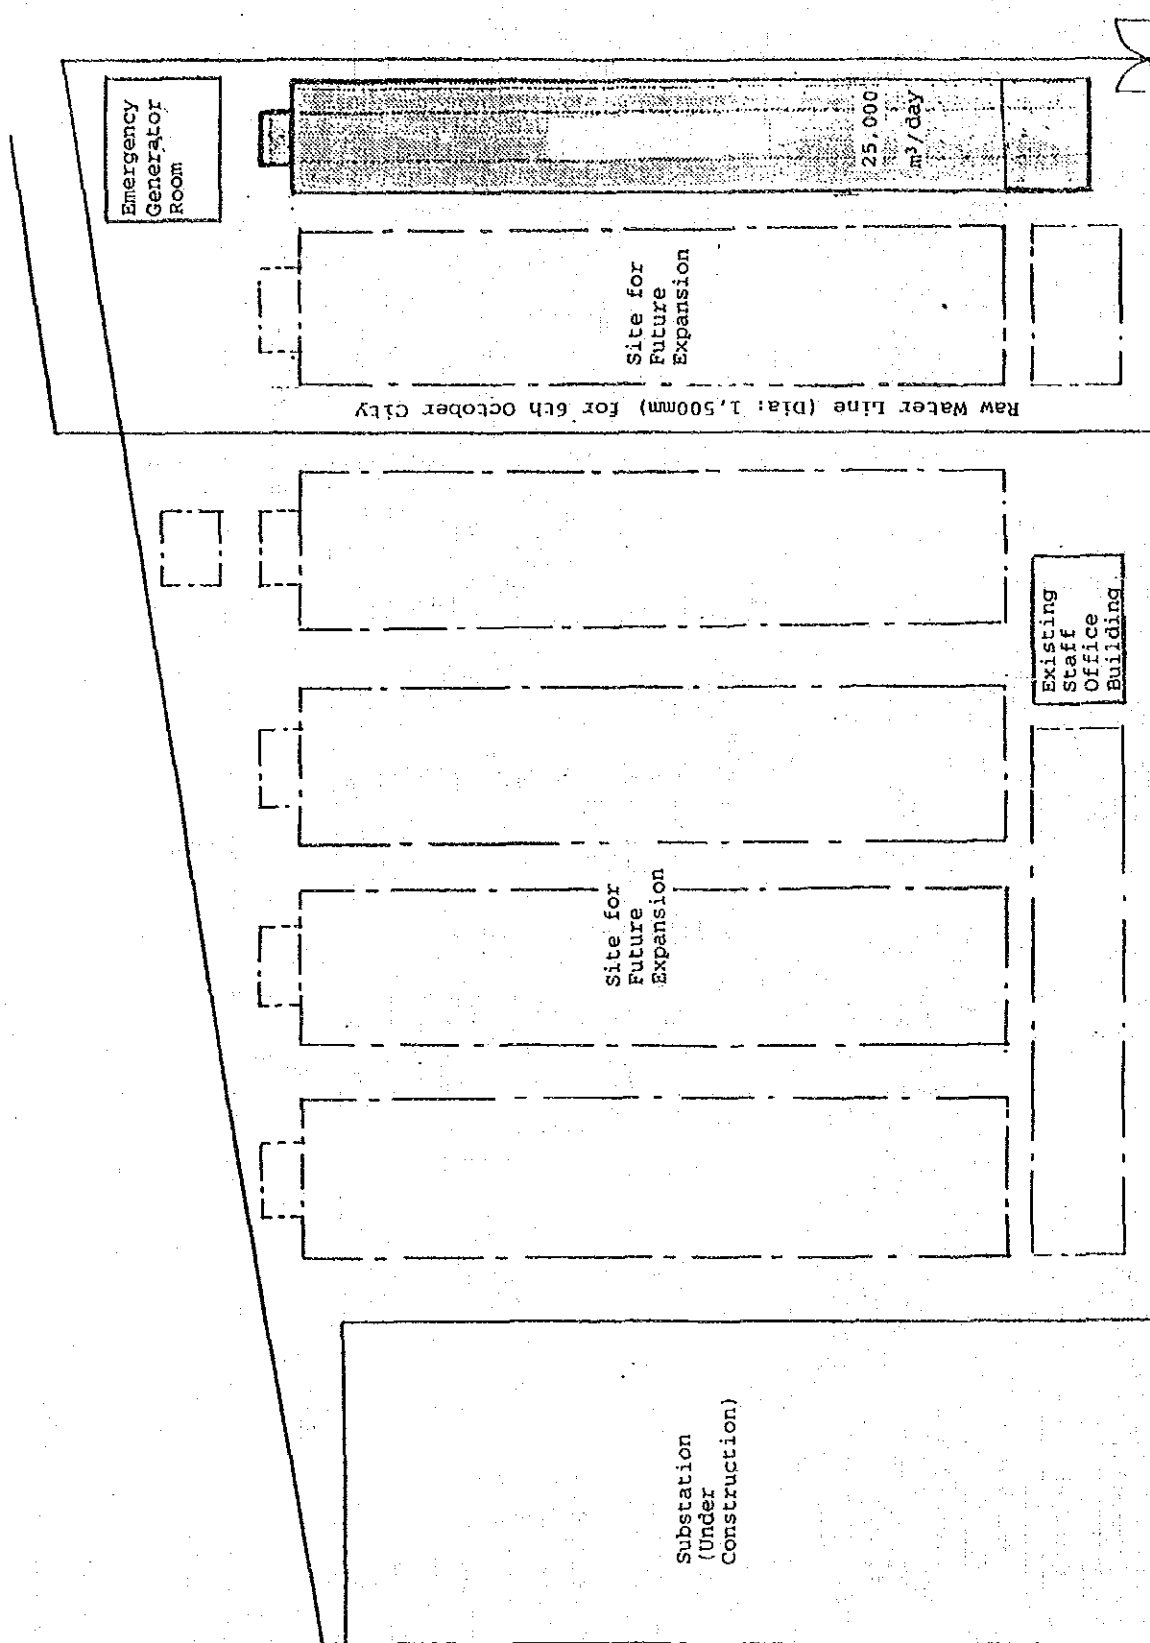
Location of Requested Project-Related Purification Plant Expansion in Overall Expansion Plan
